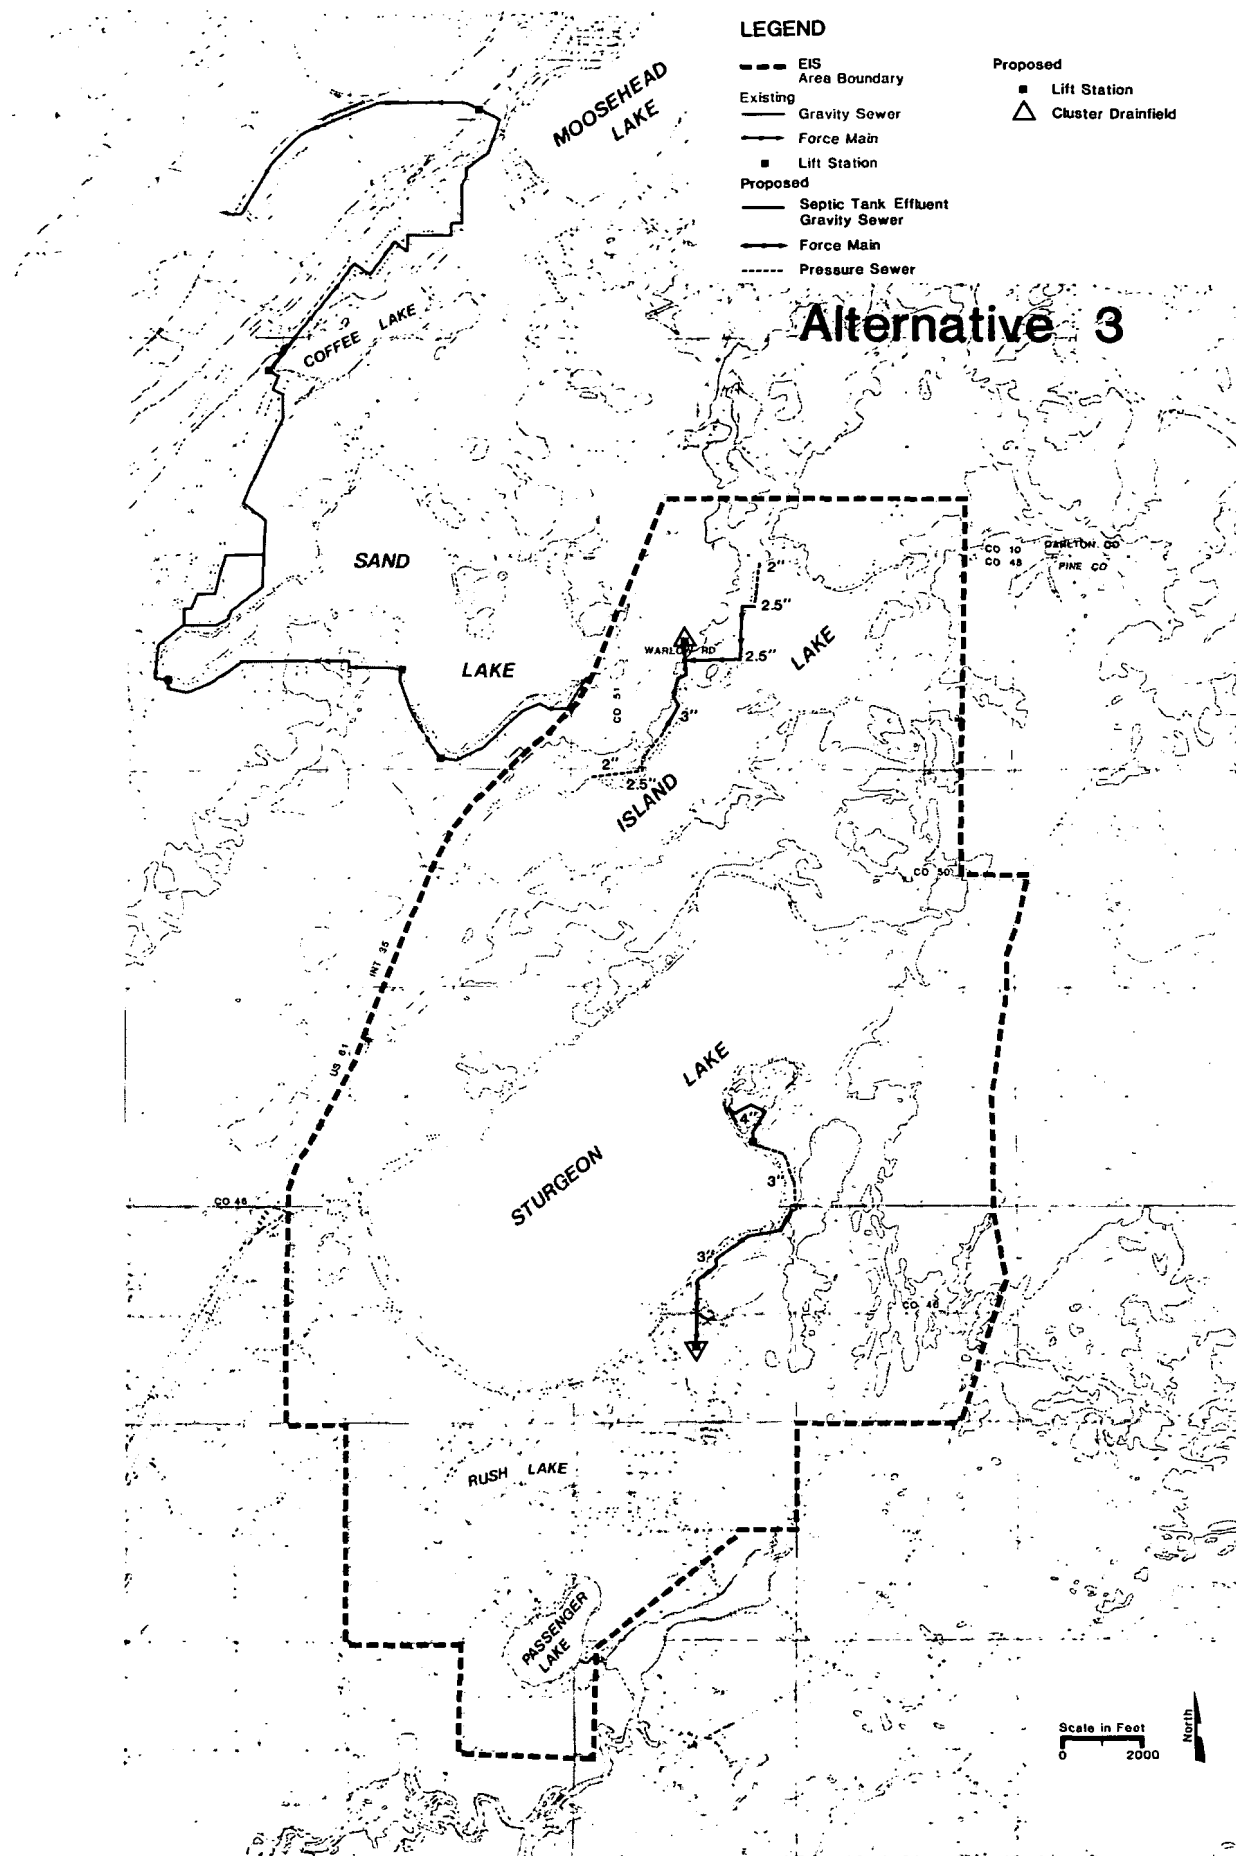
Wastewater collection and treatment facilities for Alternative 3
